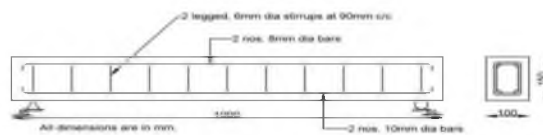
Reinforcement detailing for flexure and shear beam [9]
